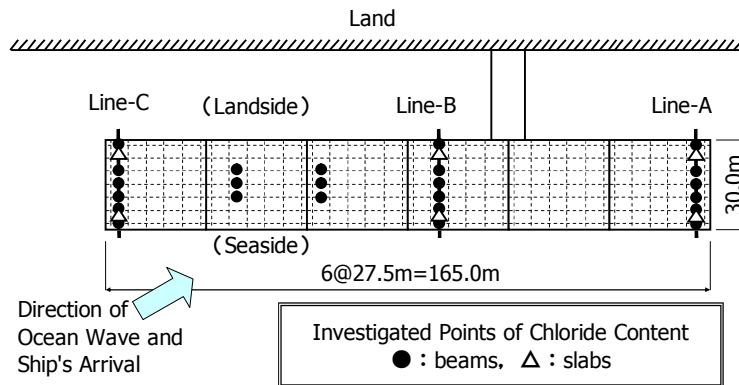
Structural Drawings of Jetty-B (OPC concrete)
